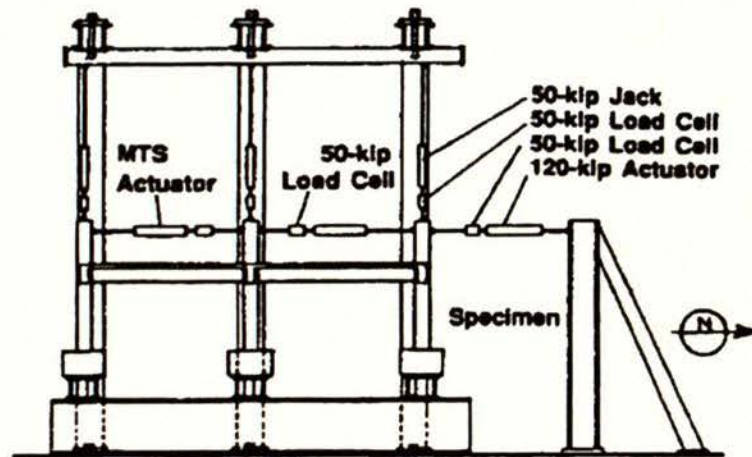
Test arrangement of two-bay frame with floor slab [Q1].
